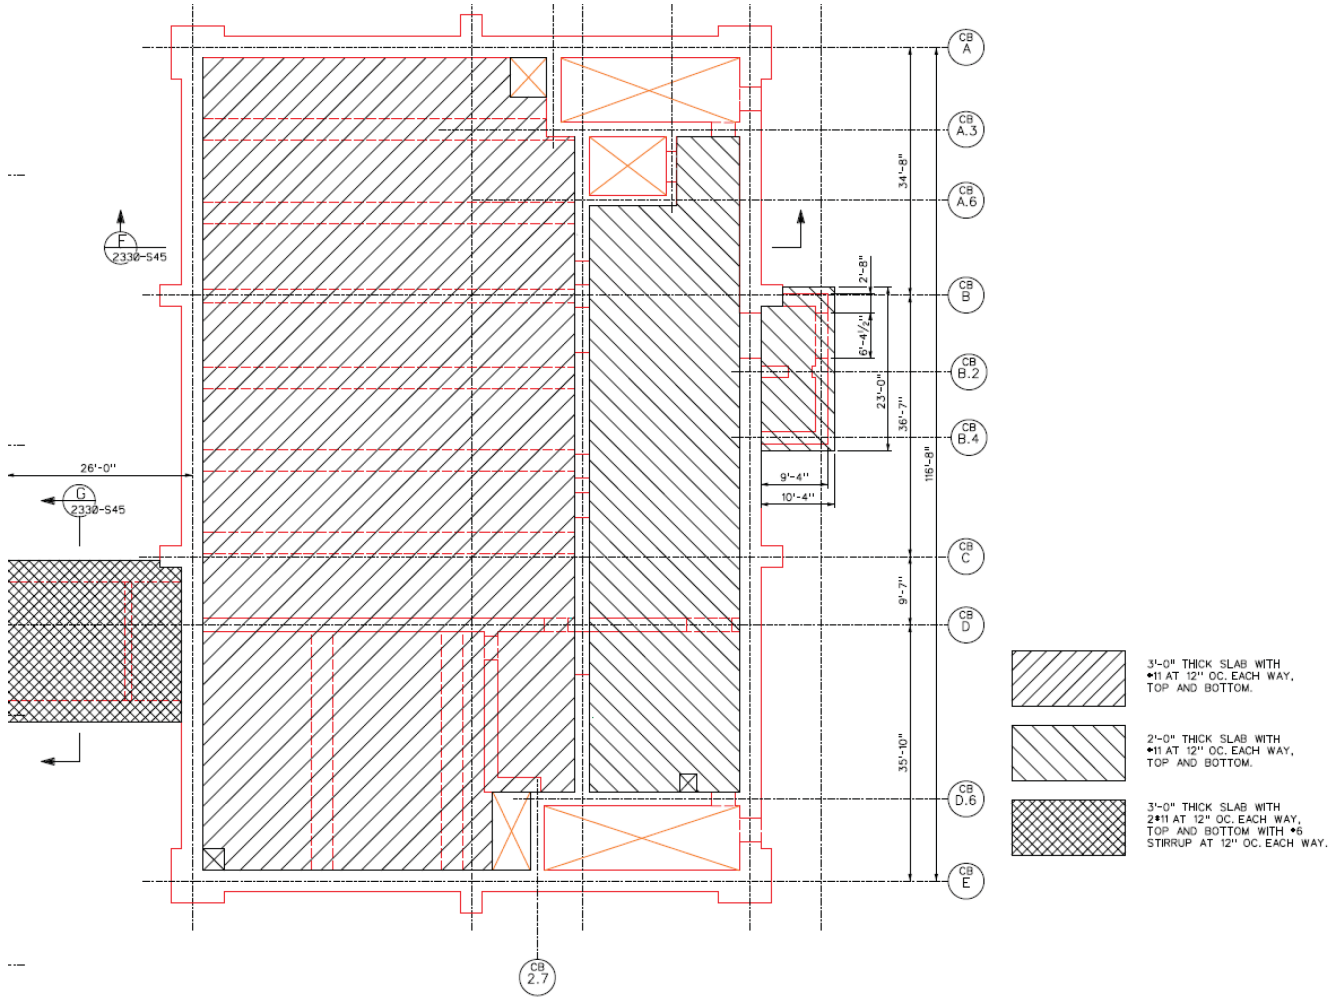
B-79: CRB Reinforcement Section Views of Slab at EL. 100'-0"
